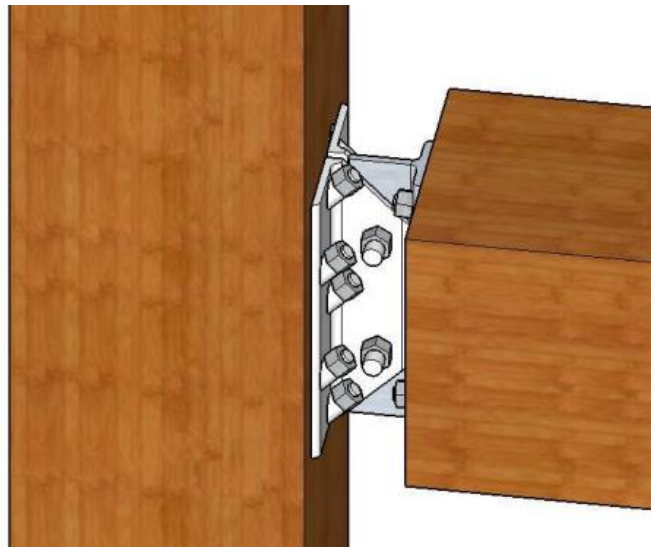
Connection between deck and column (WoodSol, 2016).
